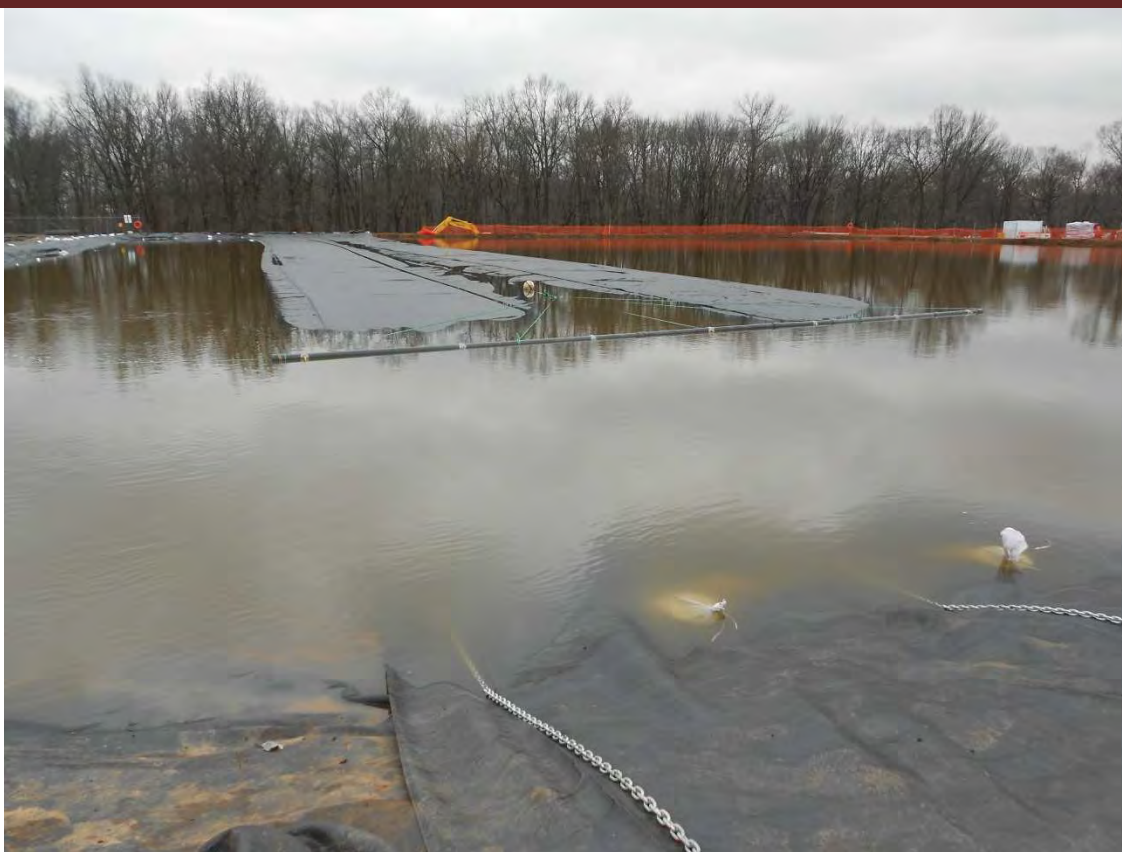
February 28, 2012 - Excavator and cable anchor used to deploy panels.
